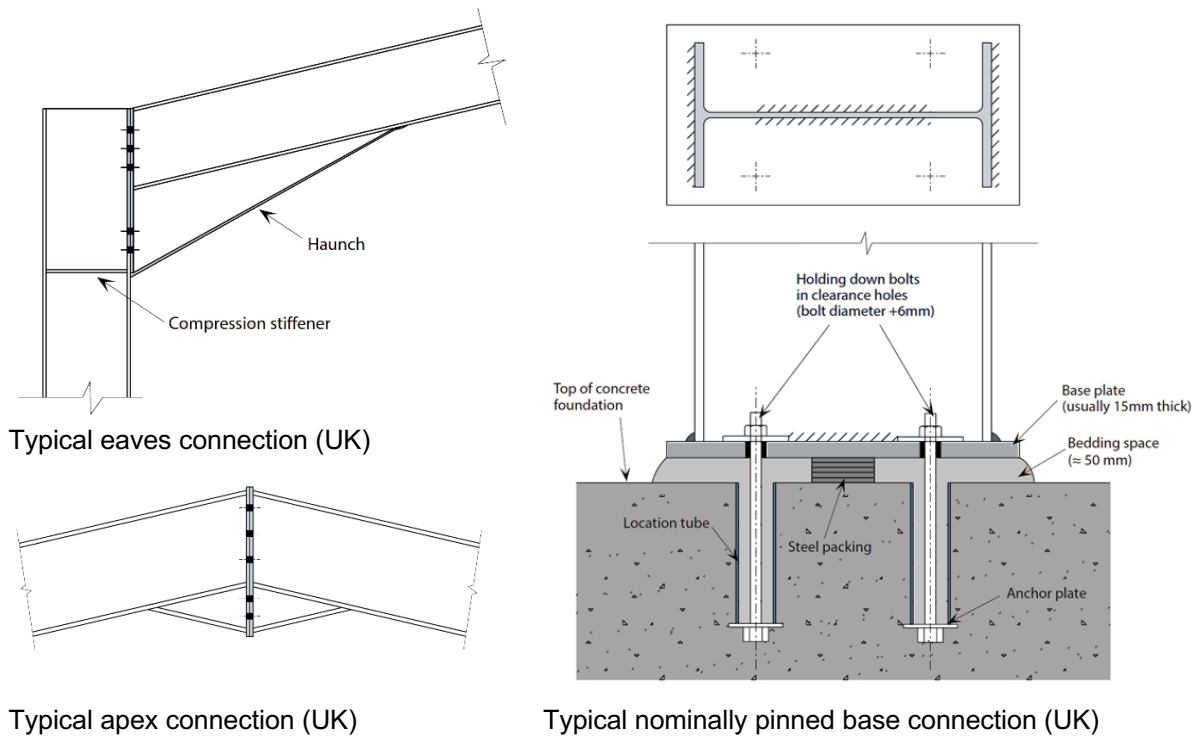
Typical detailing in a single bay portal frame with nominally pinned bases [118]
